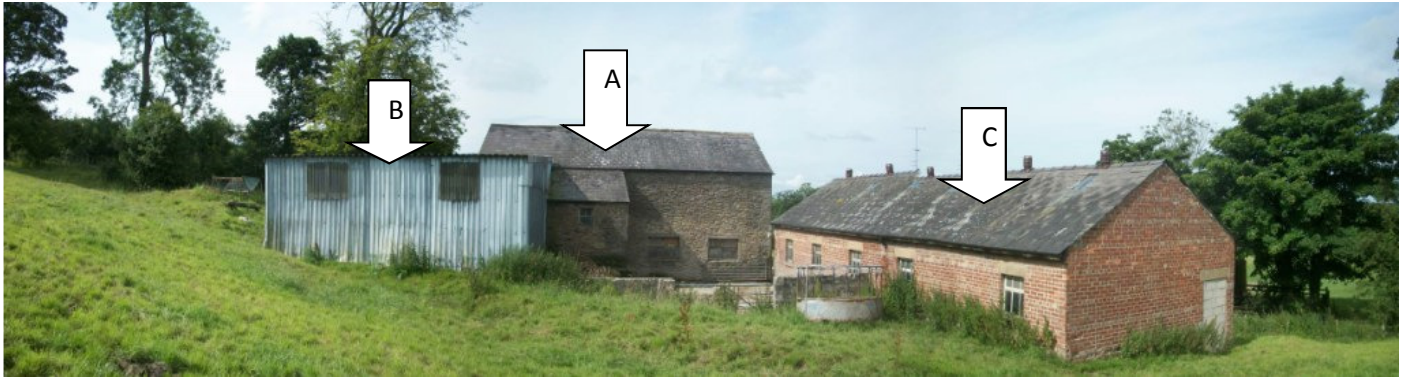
View of buildings at Wheatley Farm – buildings A, B and C
